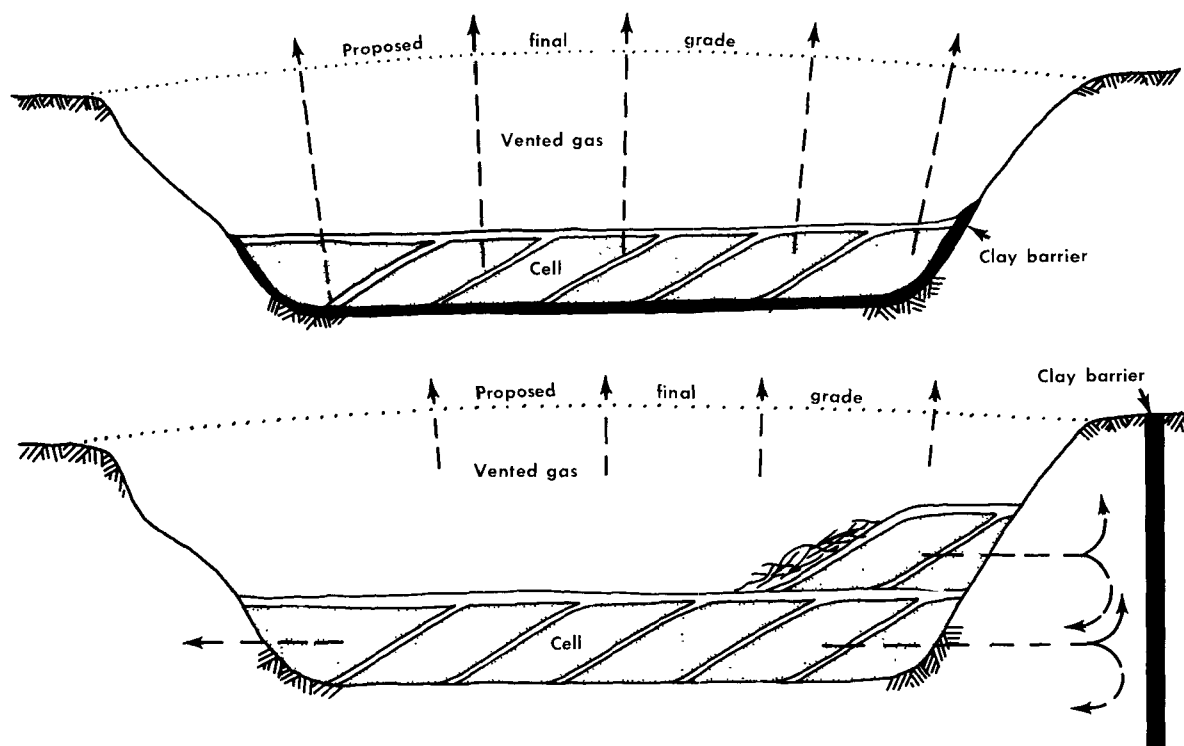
Clay can be placed as a liner in an excavation or installed as a curtain wall to block underground gas flow.
